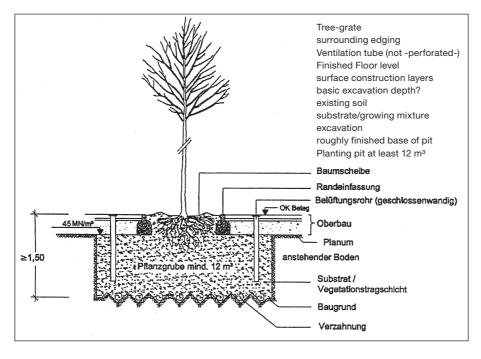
Planting pit construction method 2 (pit partially or fully built over)
